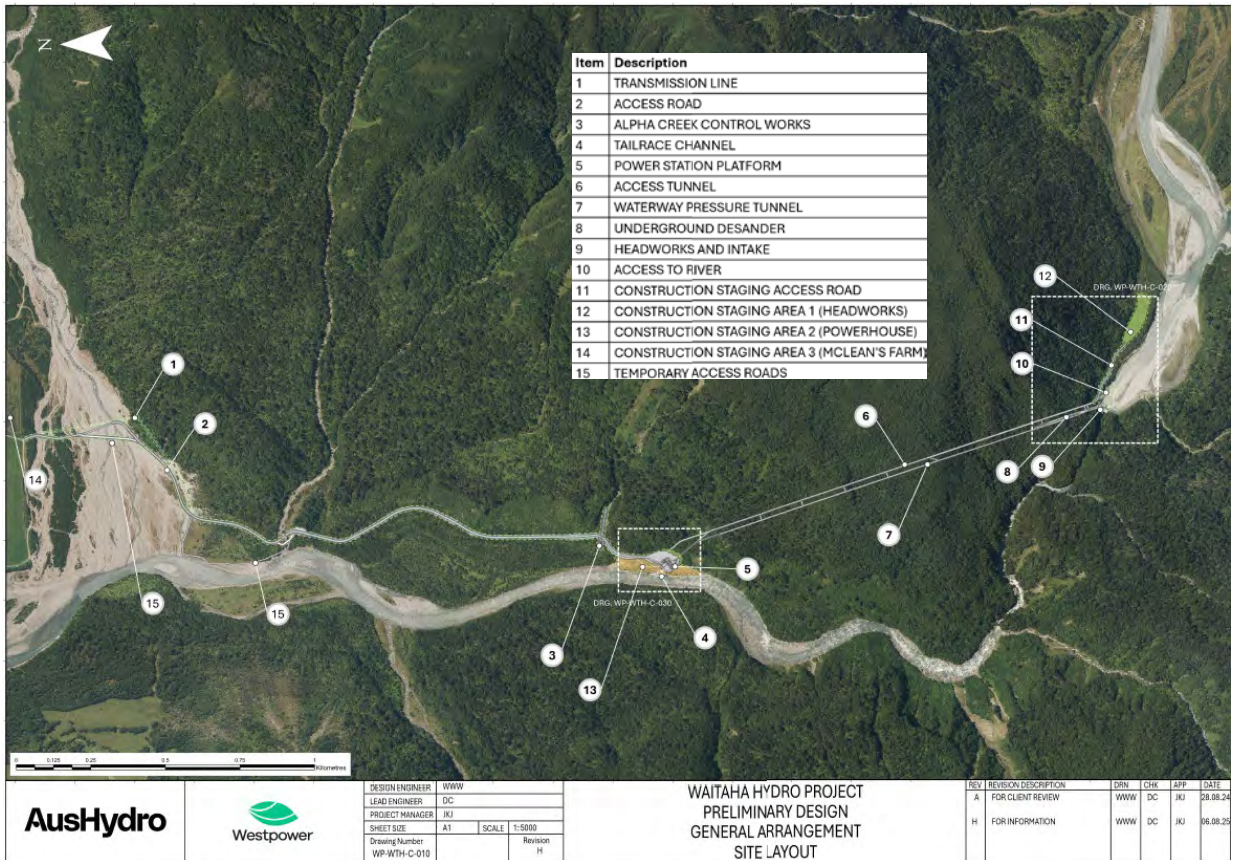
High-Level Plan Showing Hydro Scheme Layout and Key Components
